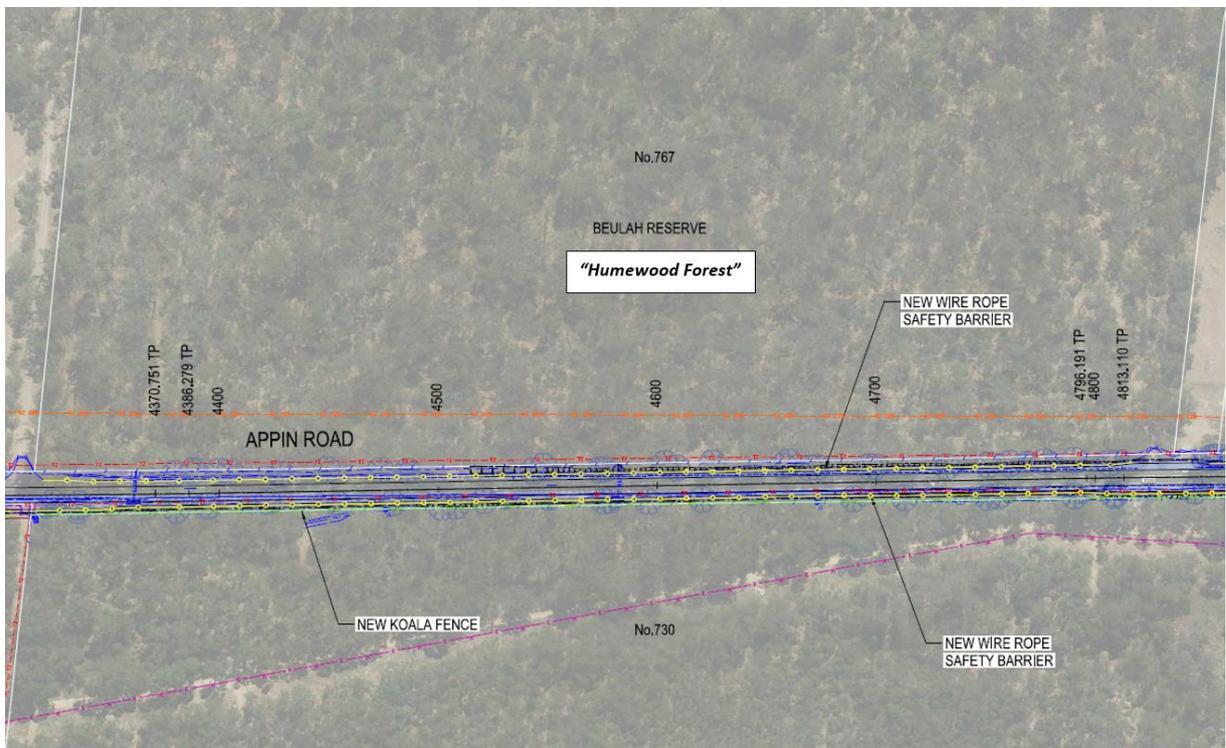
Proposed work at the site near “Humewood Forest” (located in Beulah Reserve – a biobank site) and an EEC including the installation of safety barriers (e.g. wire rope), new pavement and a new fauna fence (Source: Roads and Maritime, 2018).
